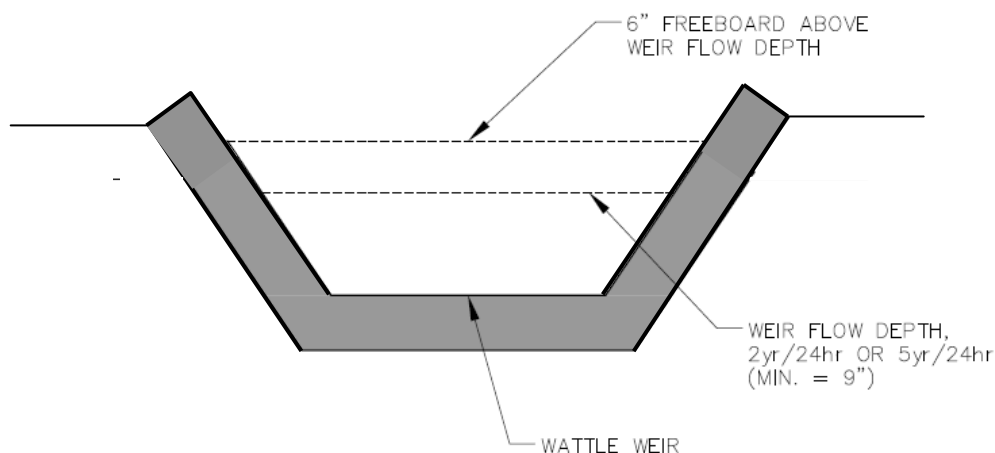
Cross sectional view of wattle installed in ditch
